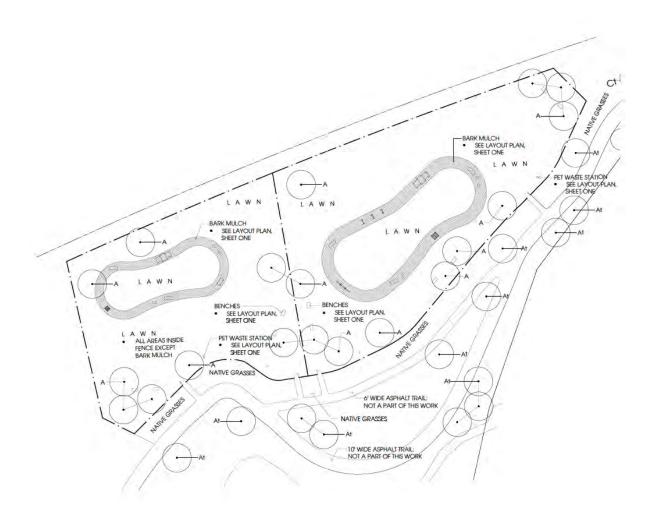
Exhibit C - Proposed Dog Park (w/Landscape Plan)
